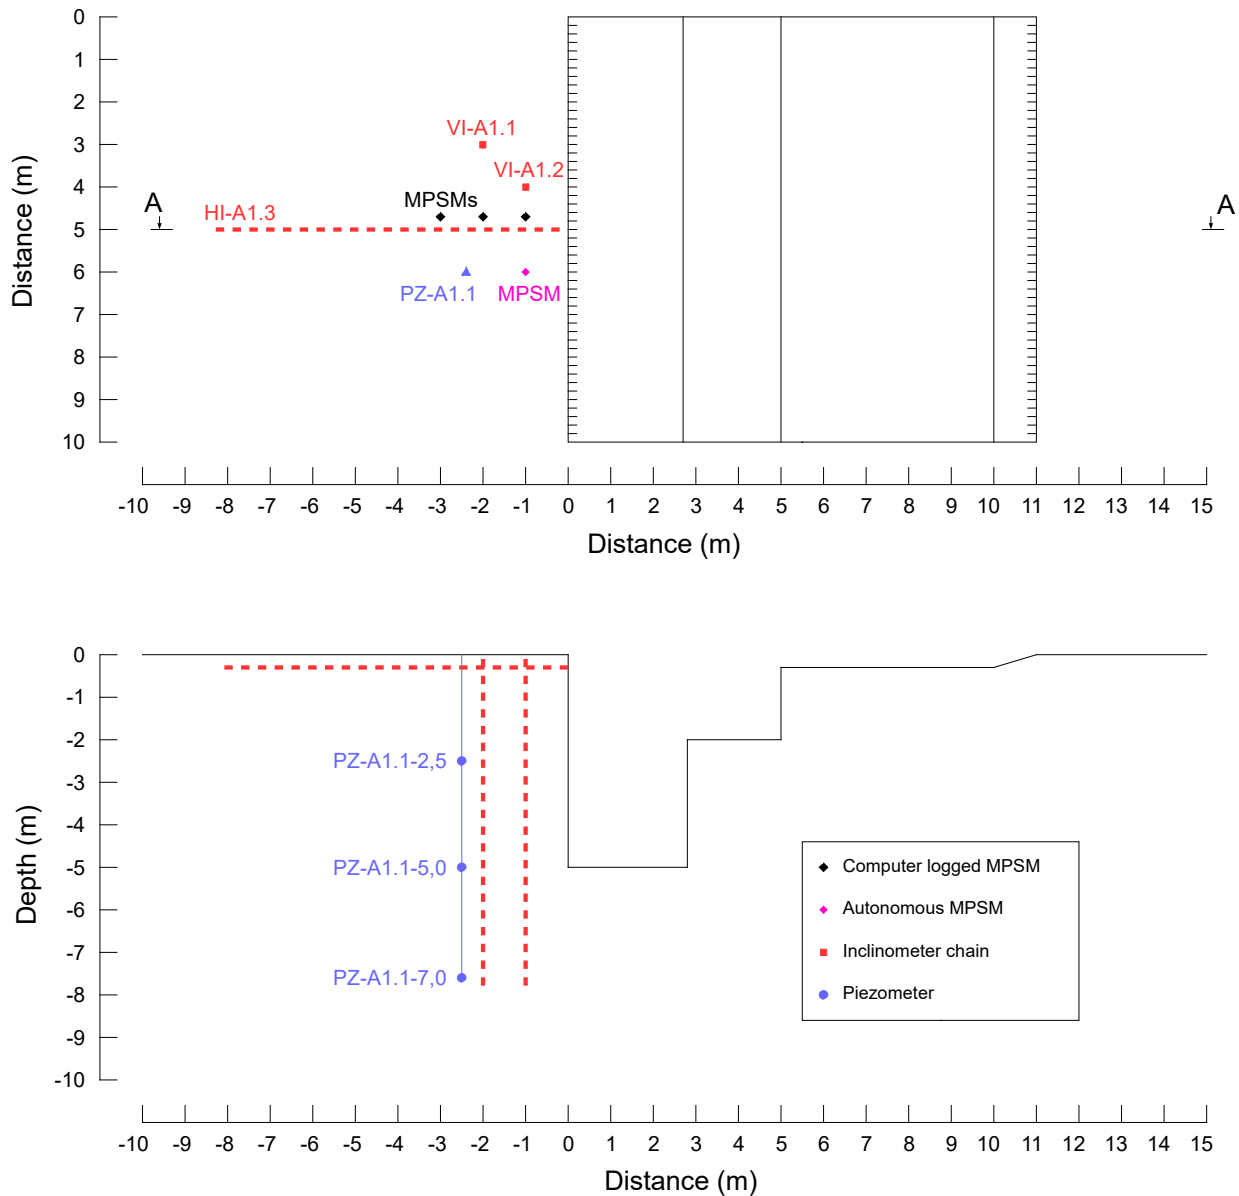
Plane view (top) and profile view (bottom) of trench A1, 10 m long, 8.75 m wide and 5 m deep, with 1 vertical wall and 1 benched wall.
